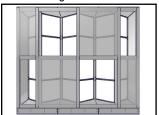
ASSEMBLY ARRANGEMENT 4
